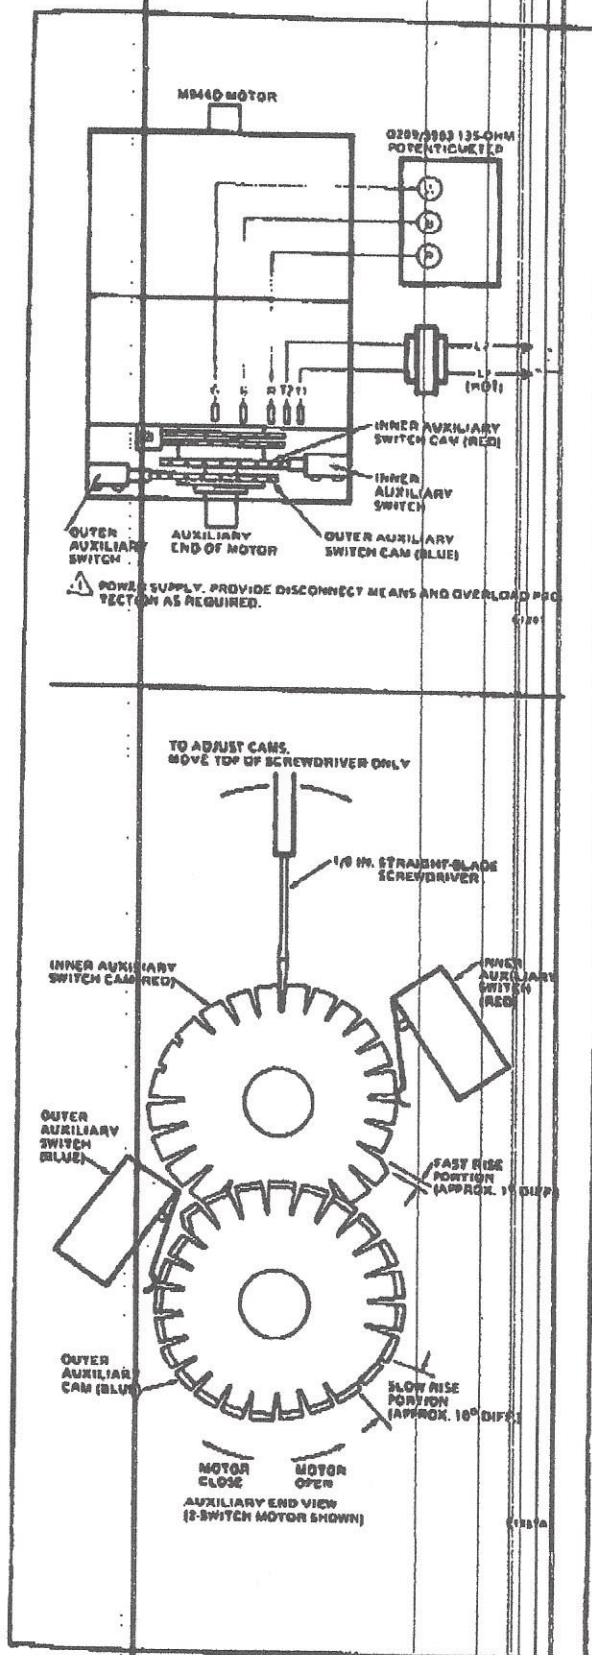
AUXILIARY SWITCH ADJUSTMENT—M944D.
